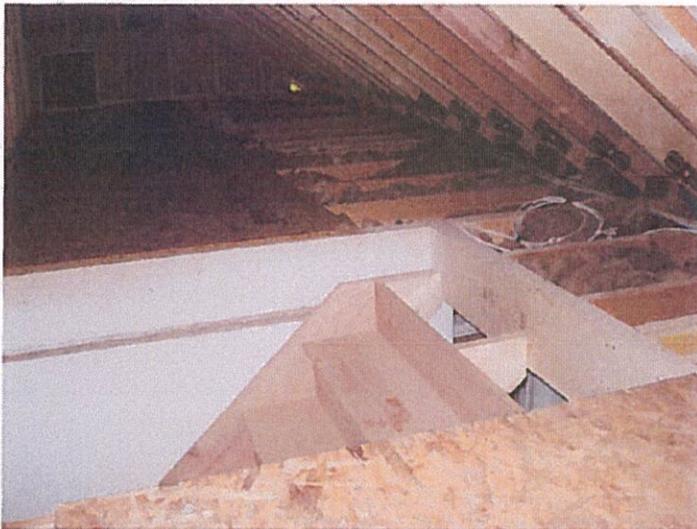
" misaligned overhang, west wall. Inconsistent with Approved House Documen
